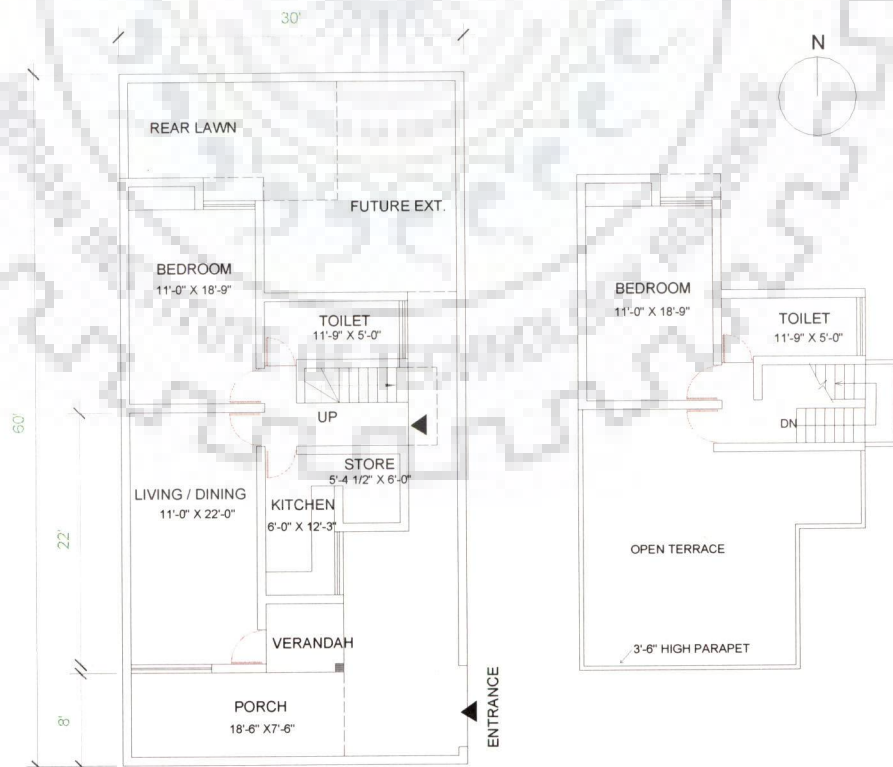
Ground and First Floor Plan of L.D.A. House.
